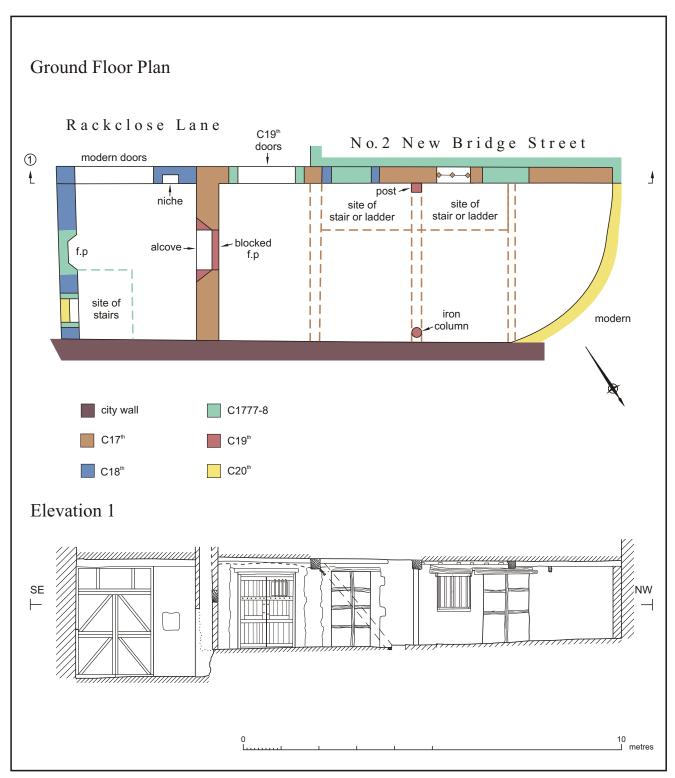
Plan of the ground floor and Section showing the internal elevation of the lower part of the south-west wall (based upon drawings by Exeter Archaeology).
